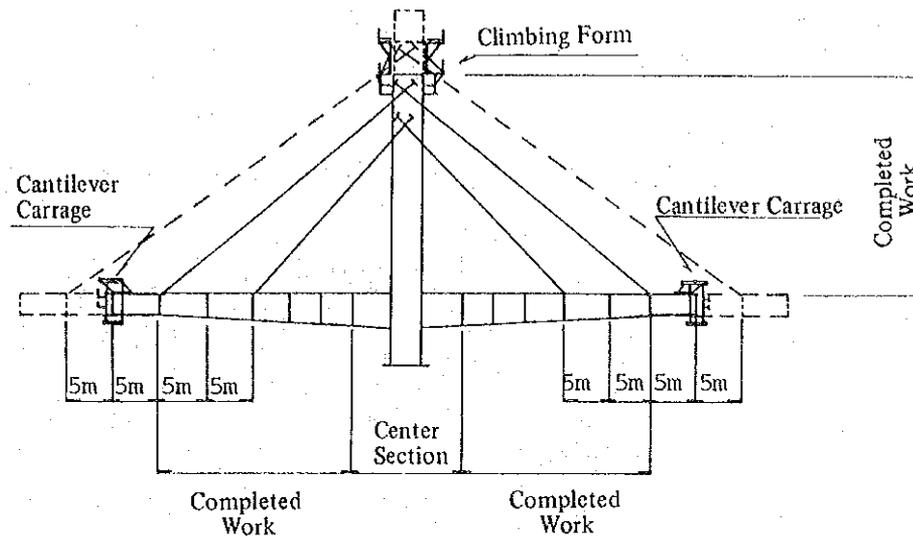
CONCEPTIONAL WORKING PLAN OF MAIN GIRDER
